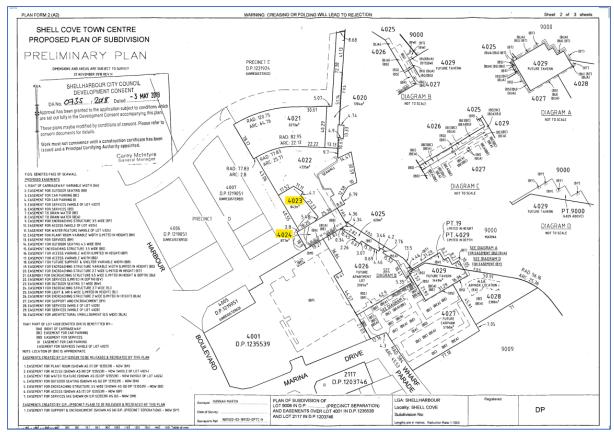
DA0735/2018 Approved Subdivision Plan (relevant lots highlighted)
